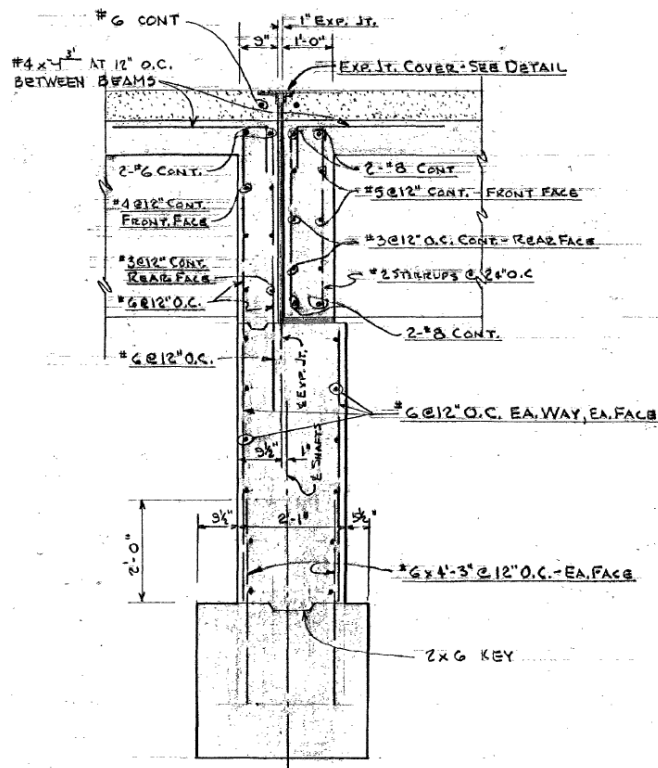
Cross-section through expansion joint at Bents 10 and 17, reproduced from PHA drawings.
